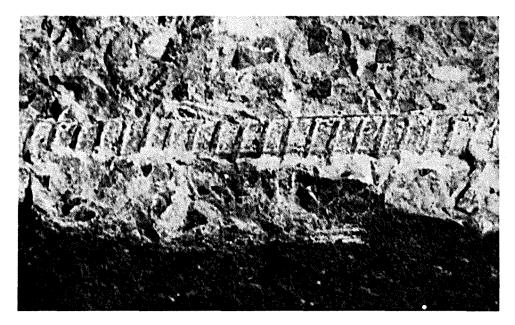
Uncorroded condition of reinforcement bar beneath unspalled concrete
